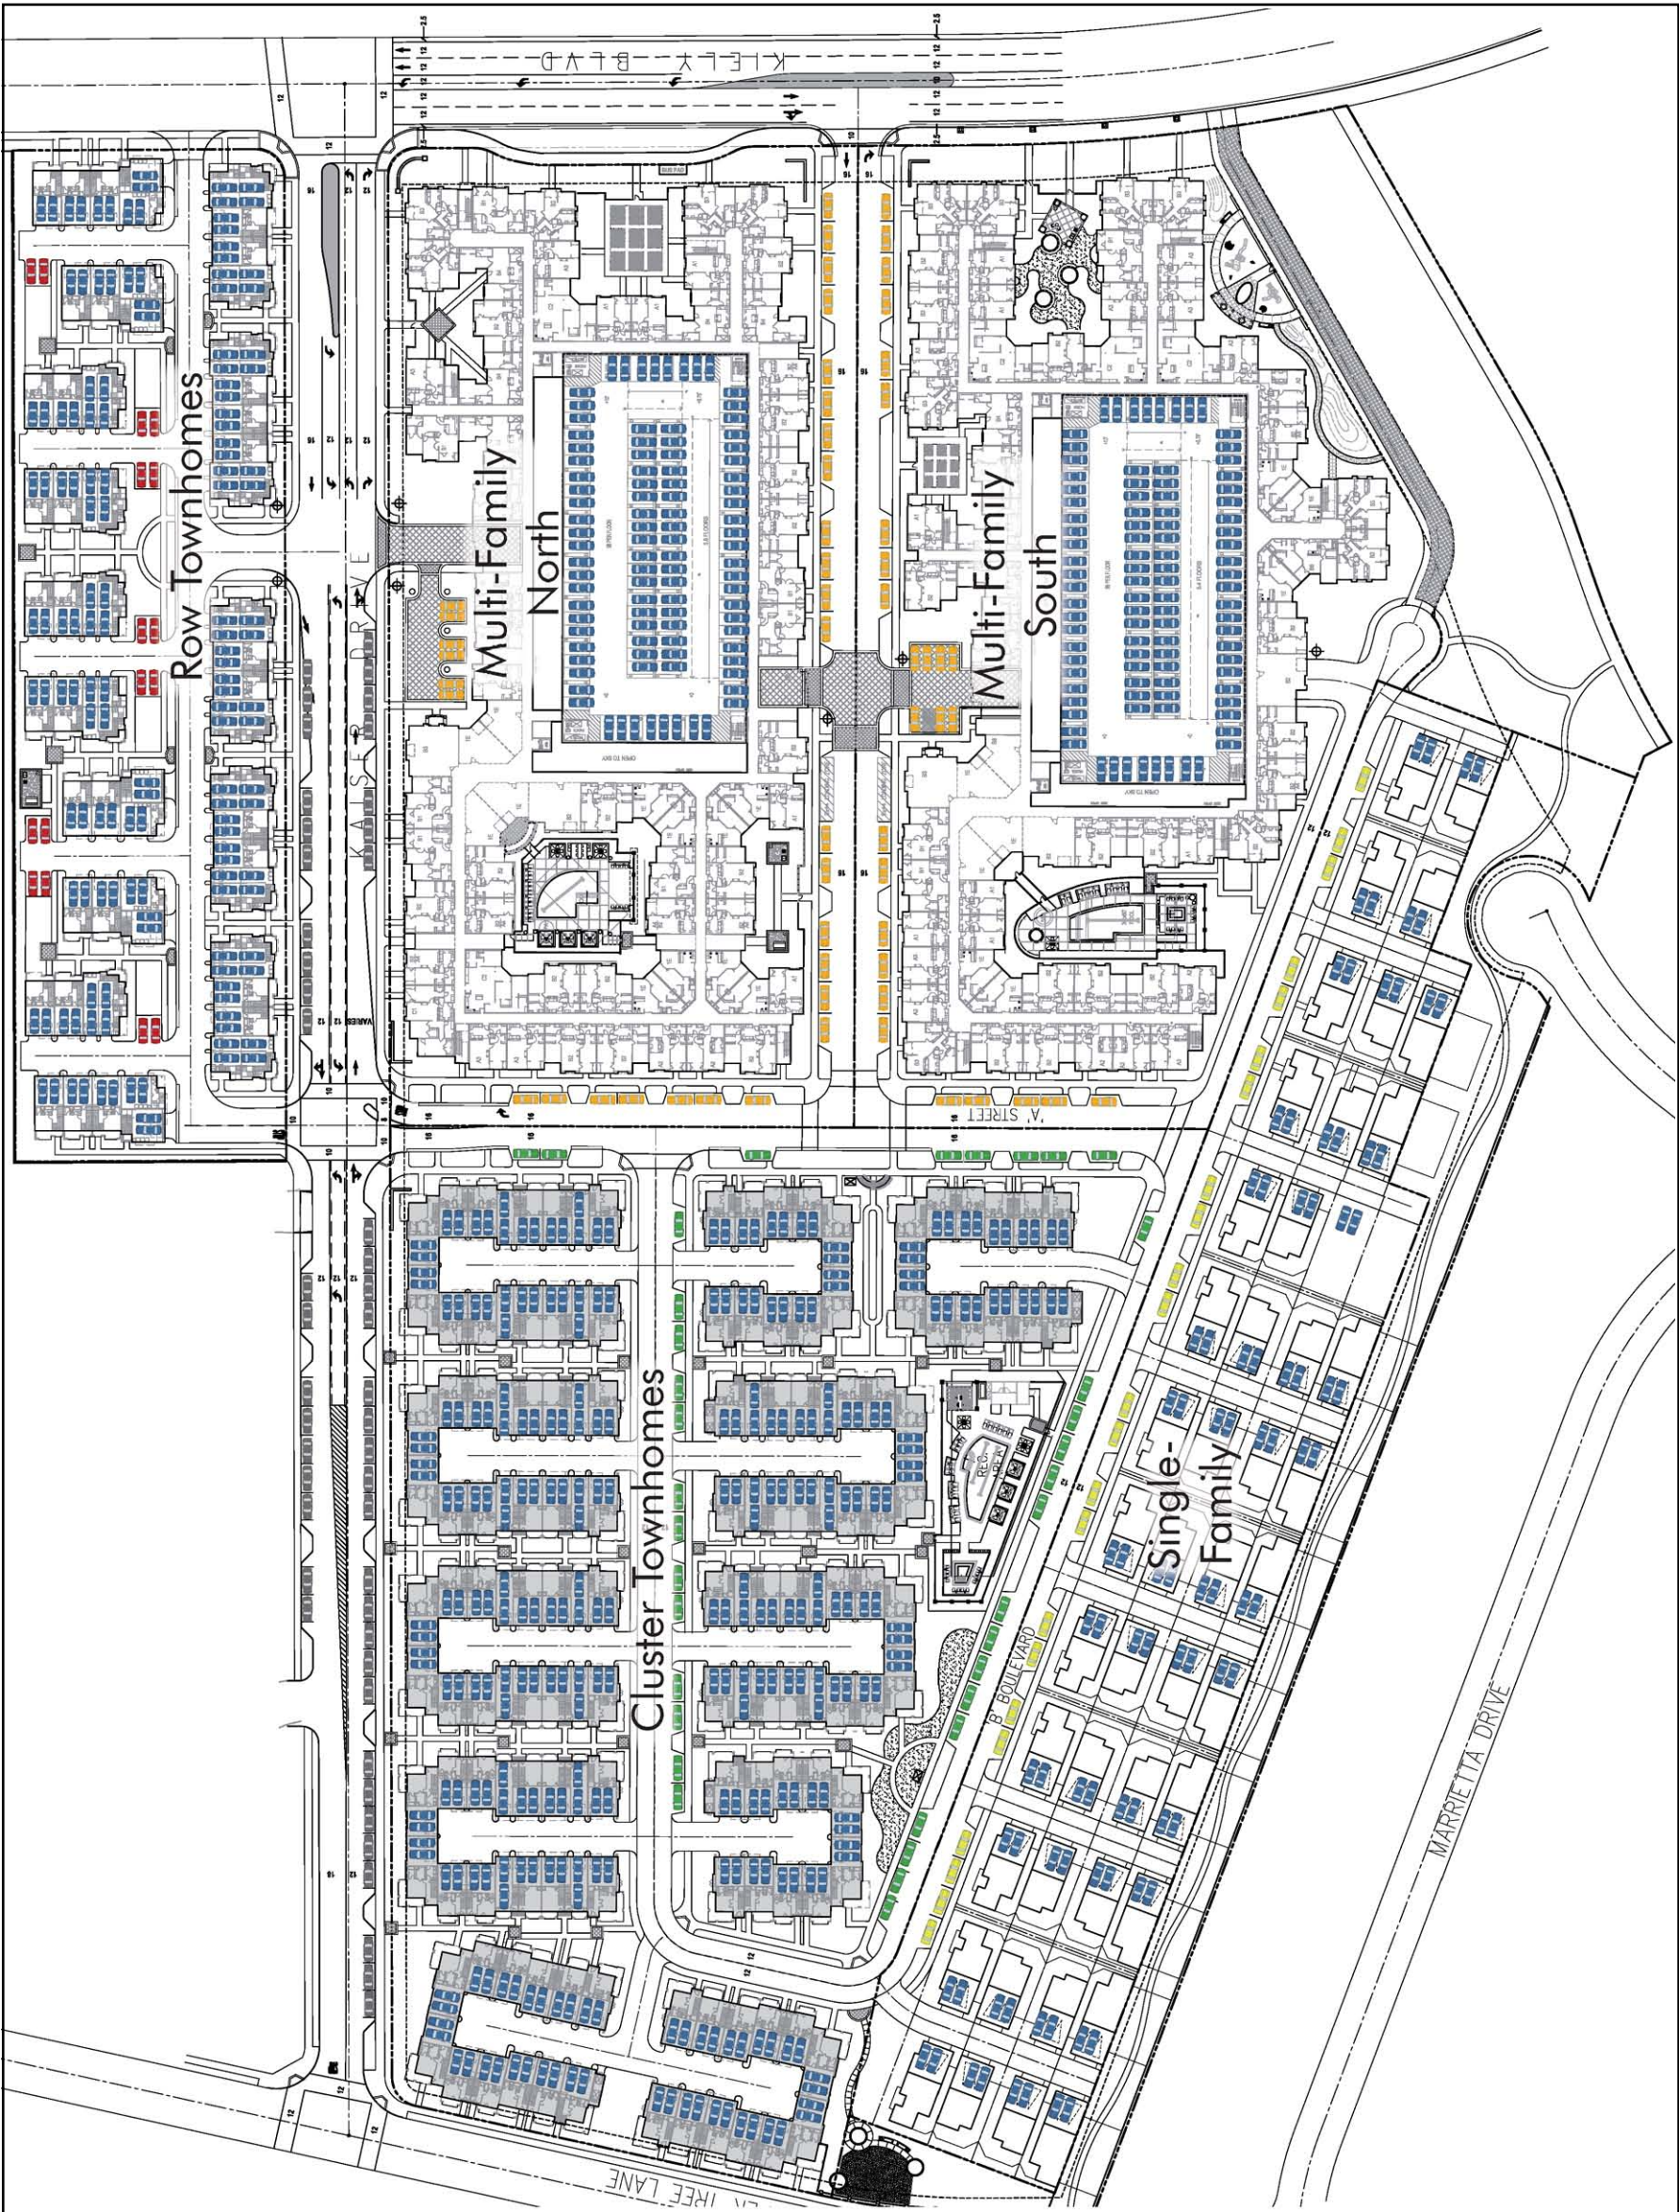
, Proposed Vehicular Circulation and Parking Plan, shows the conceptual vehicular circulation and parking plan for the project site. Access to the site would be provided from Kaiser Drive and Kiely Boulevard. Kaiser Drive is currently a private street with an easement that allows vehicles from the neighborhood west of the street to access Kiely Boulevard. Kaiser Drive would be dedicated for use as a public street as part of project approval. No driveways would be provided on Pepper Tree Lane or Miles Drive. Parcels 1 and 2 are proposed to have one primary access road entry and parking lot entrance from Kaiser Drive and one secondary access road entry from Kiely Boulevard. The secondary entry from Kiely Boulevard would be right-in/right-out only. Parcel 3 is proposed to have two driveway entries from Kaiser Drive. Primary and secondary streets would be constructed to provide internal circulation, with the main vehicular circulation in a north-south and east-west direction. Emergency vehicle access would be provided from Kiely Boulevard. Table 3.0-2, Proposed Parking and Figure 3.0-5 shows the number of parking spaces and configuration of parking proposed at the project site. As shown in the table, a total of 1,790 parking spaces would be provided, including 2 parking spaces for each housing unit on the site and 133 guest parking spaces.
